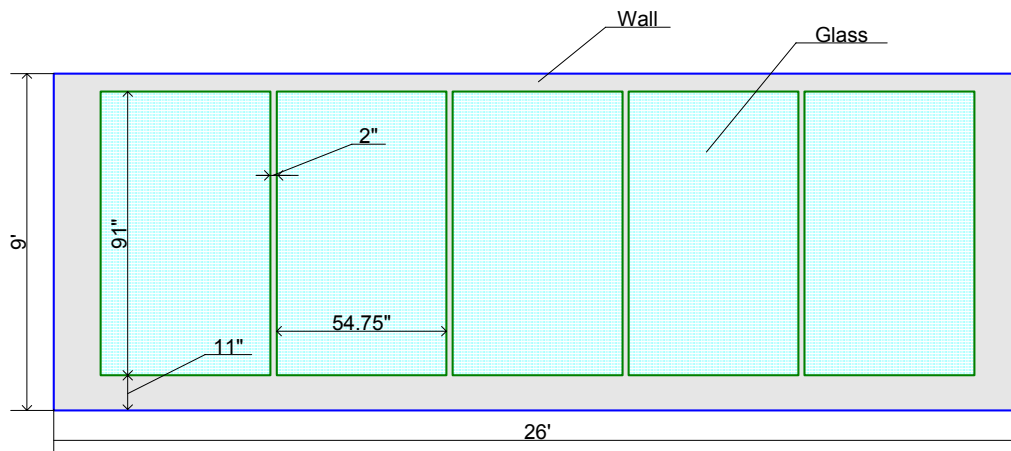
Double glazed window (5 sections) on the west wall of the test room
